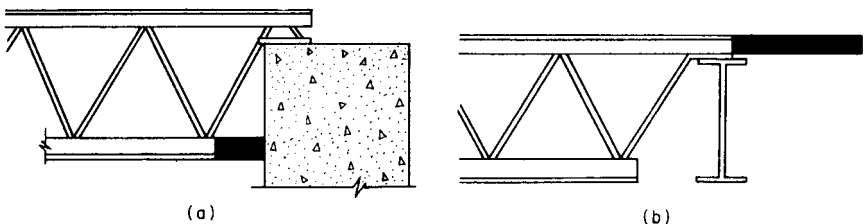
Open-web steel joist with (a) ceiling extension. (b) extended end. (Courtesy of Steel Joist Institute.)
